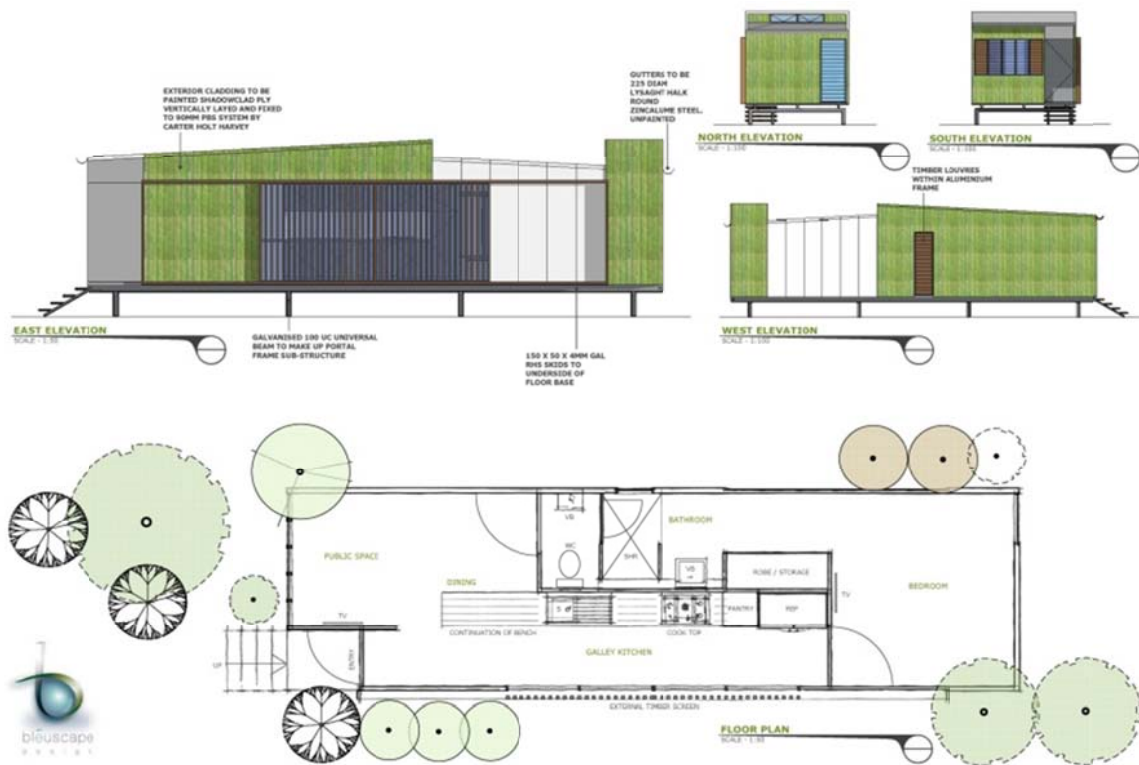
Bluescape Design – Mining Hut Plan & Elevations
